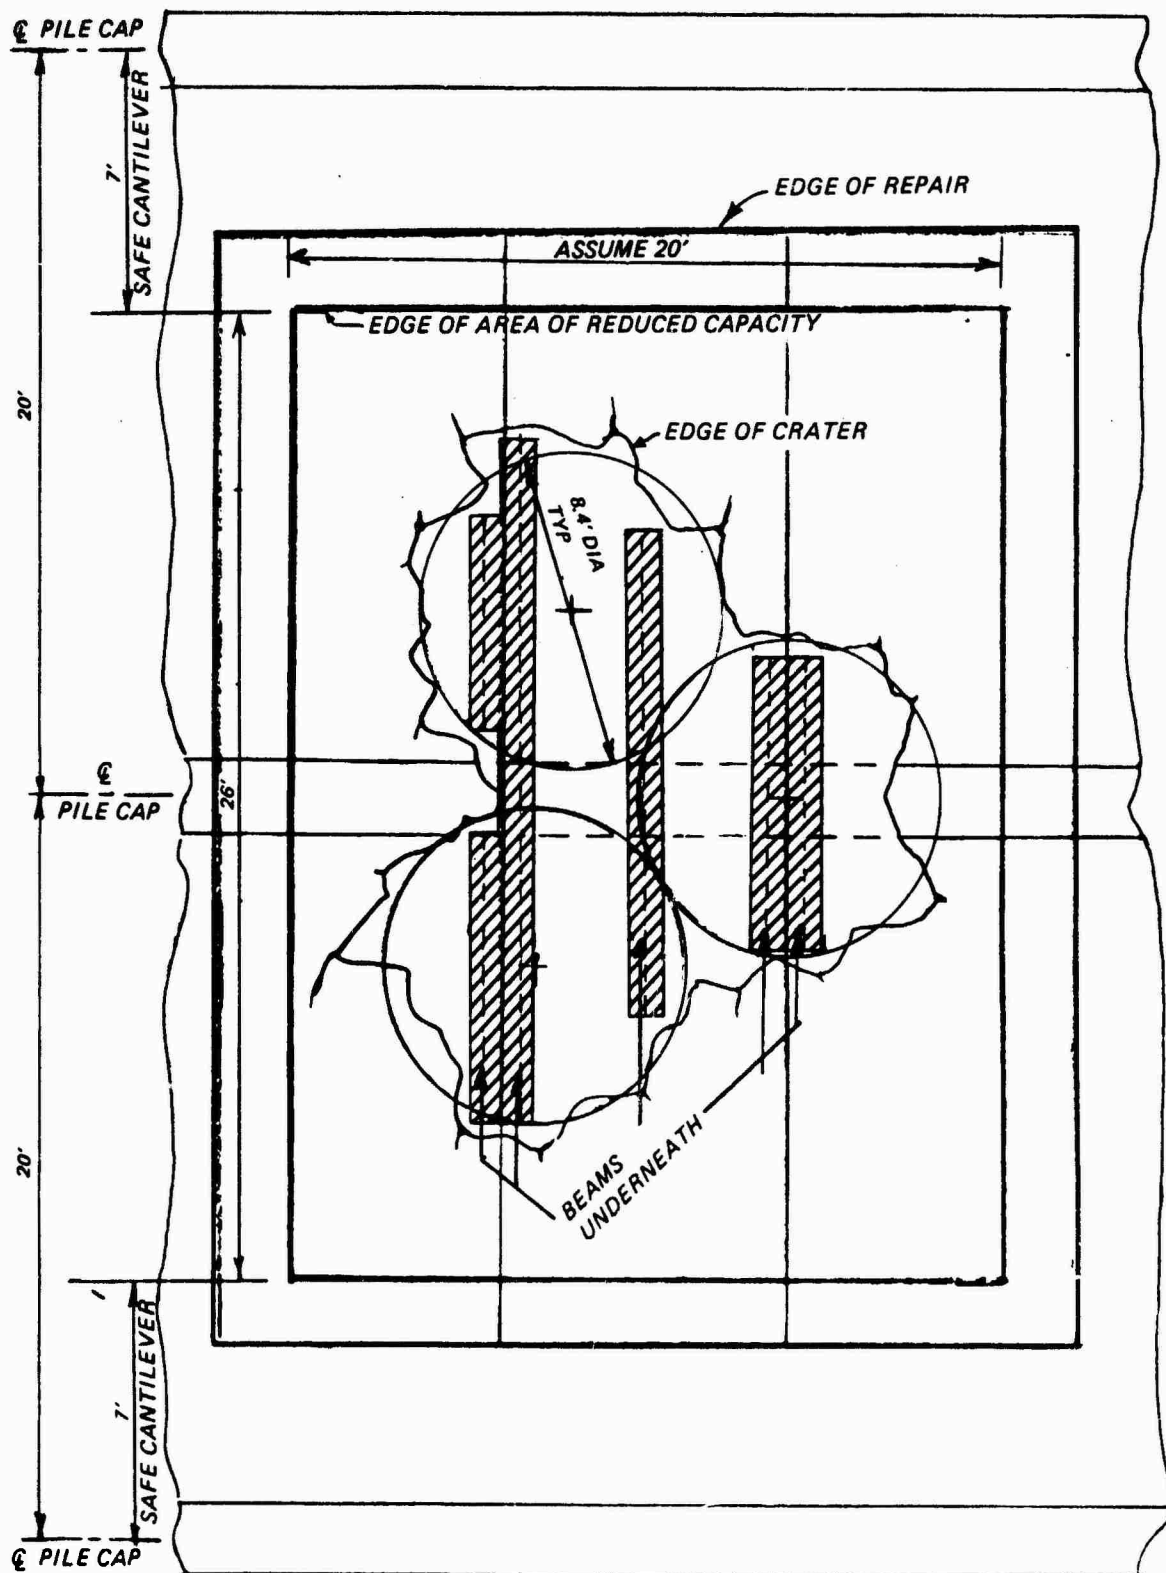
Steel plate reinforced with steel beams (Repair for Case 3 damage, 60 ft of steel beam required, 3 plates, 8- by 30-ft, 1 in. thick required (Reinforced plate subconcept))
